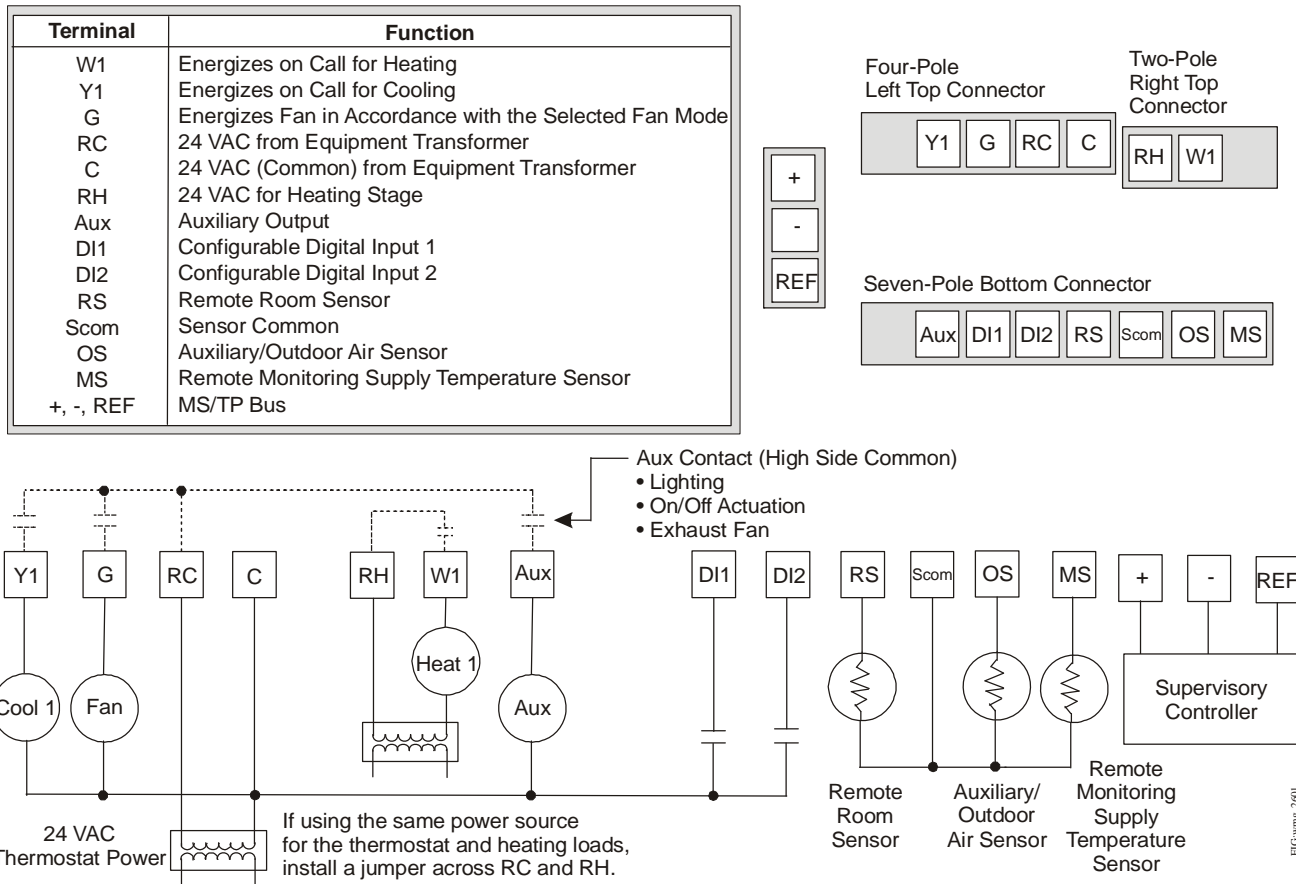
Wiring the TEC2601-4 or TEC2601-4+PIR Thermostat Controller
